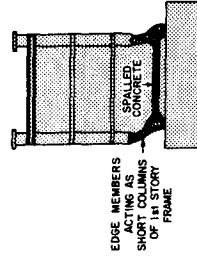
MECHANISM OF FAILURE OF WALL SPECIMENS
